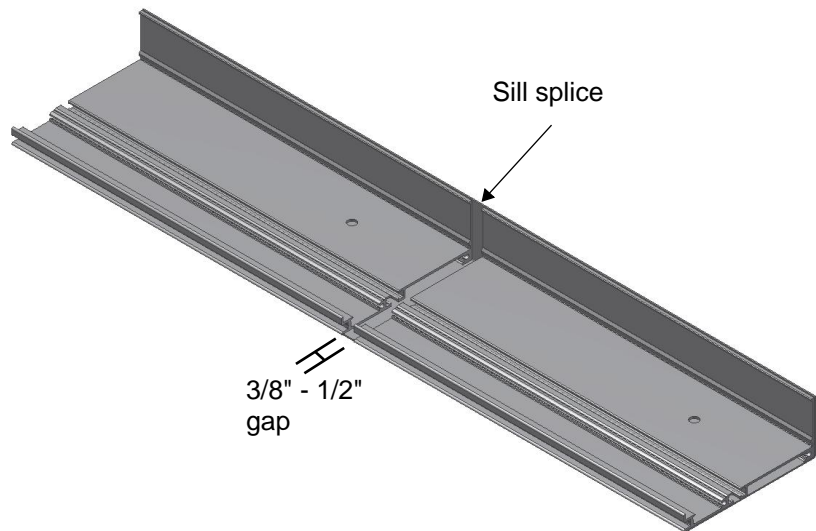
Extruded sill flashing longer than 24' in length should be spliced.
